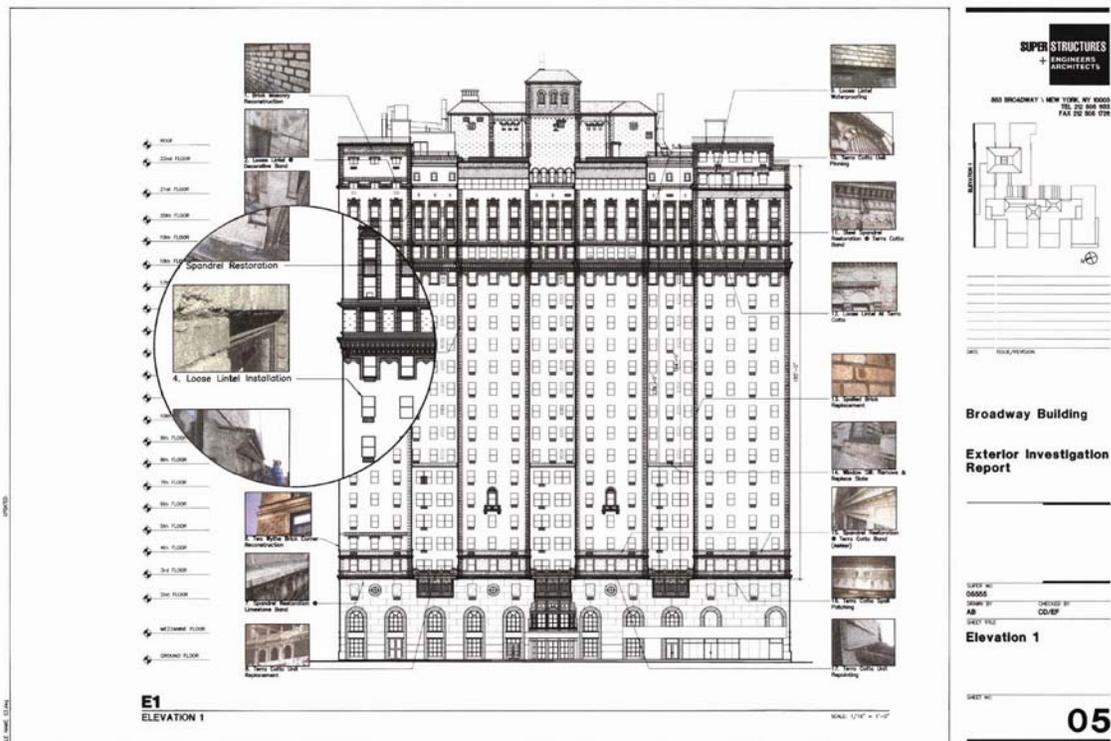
Superstructure’s drawing elevation. (Source: Superstructures Engineers and Architects. (2004): *The Red Brochure*. Superstructures Engineers and Architects, New York).
